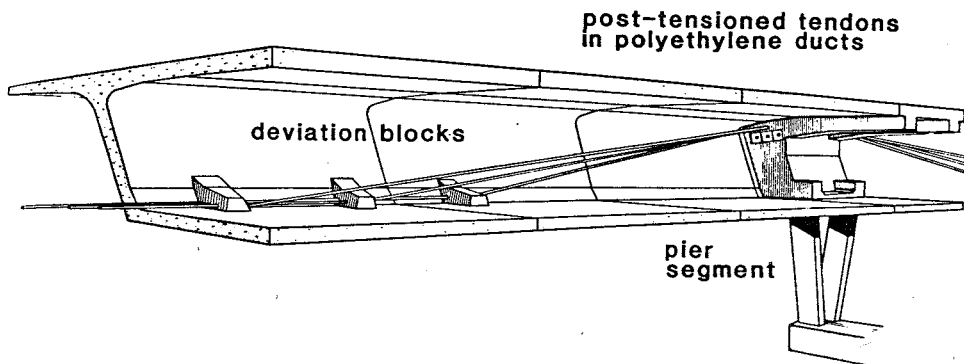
Box Girder Bridge with External Tendons (from Ref. 7).
